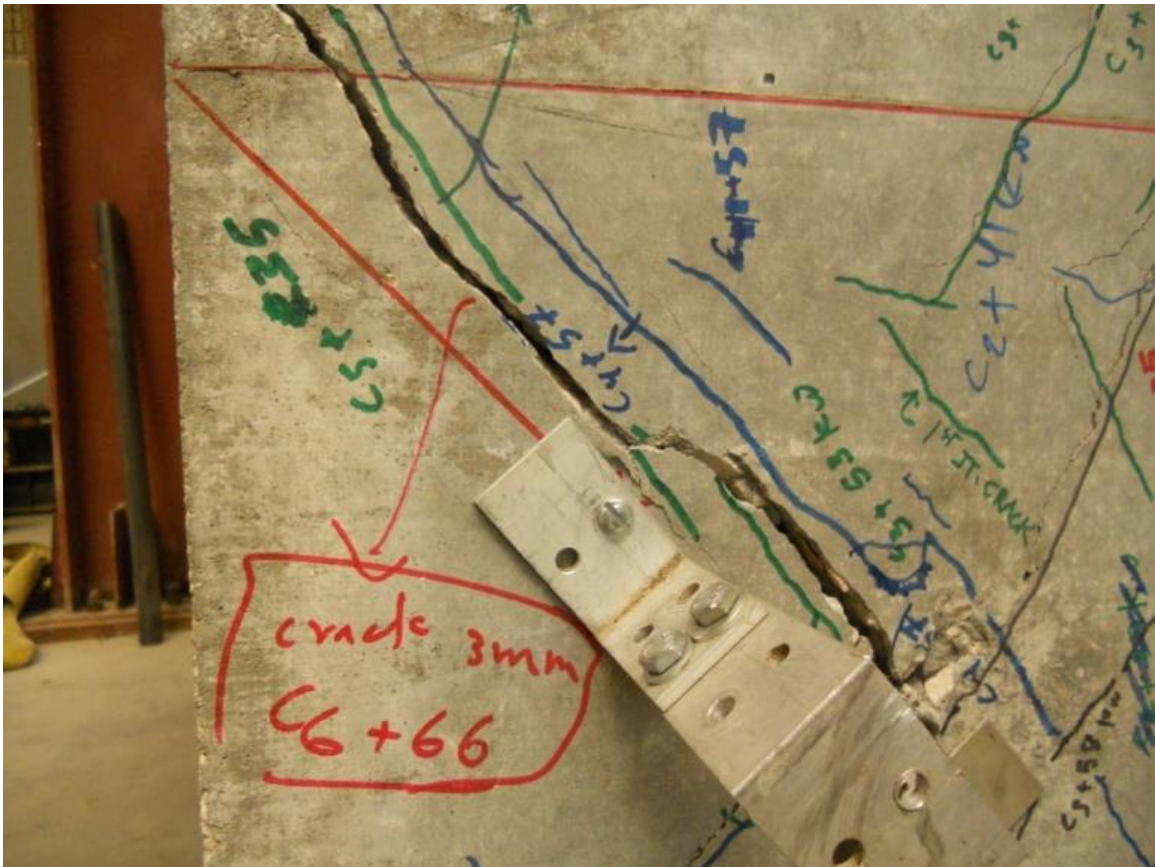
Widening up of shear diagonal crack in joint for specimen BCJ-12MM-Bent Up
